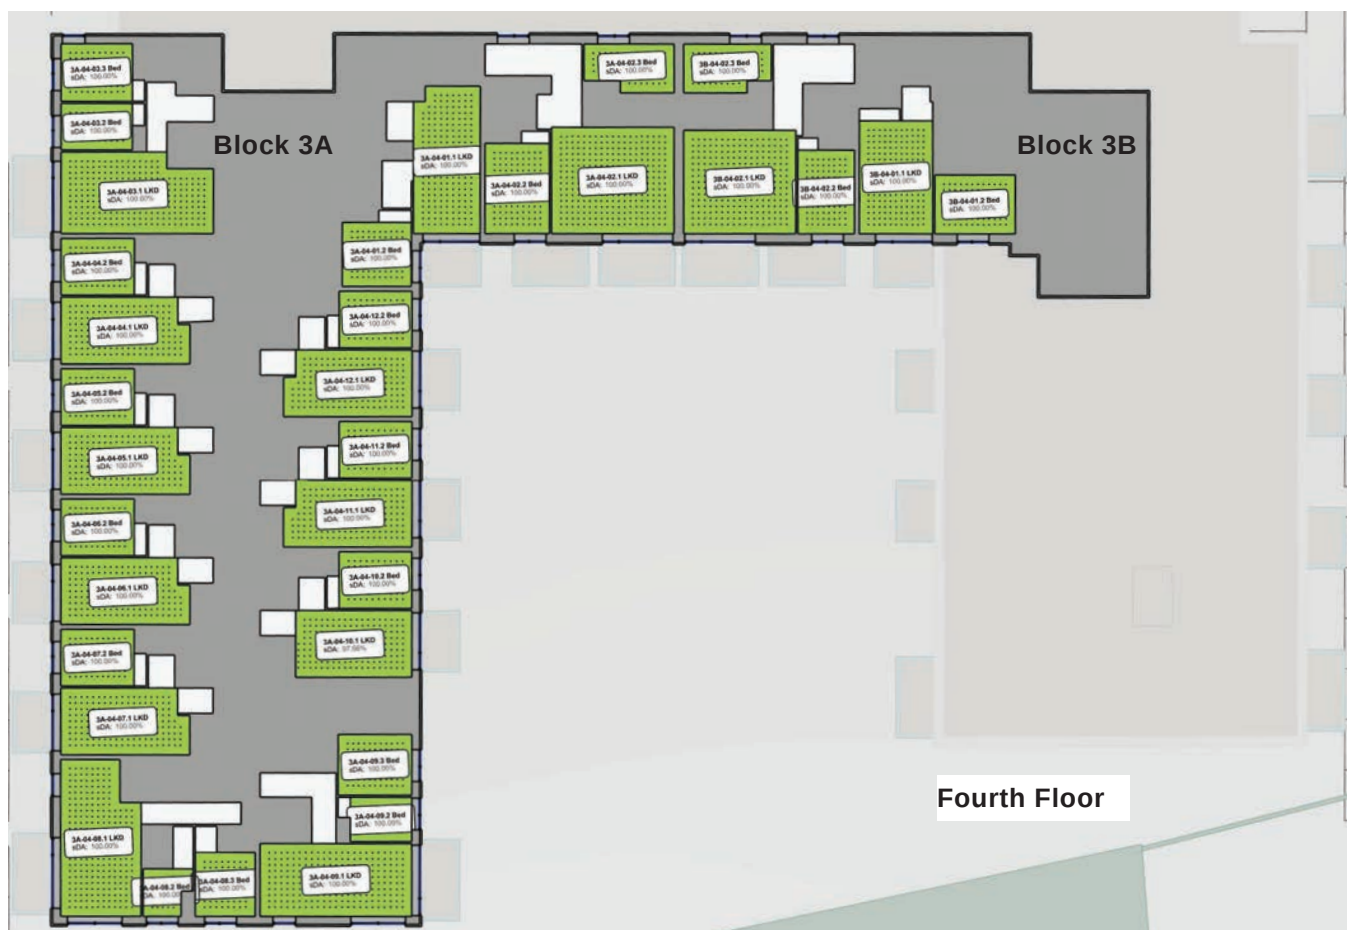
Block 3 - Floor plans indicating Daylight Provision to BS EN 17037:2018+A1:2021
